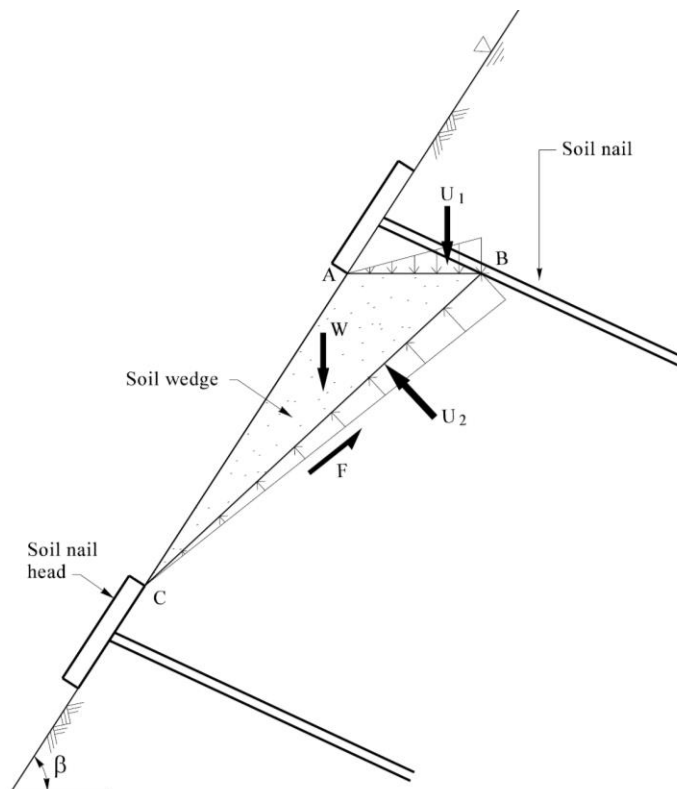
Failure mode of local instabilities considered in the GEO report No. 175
